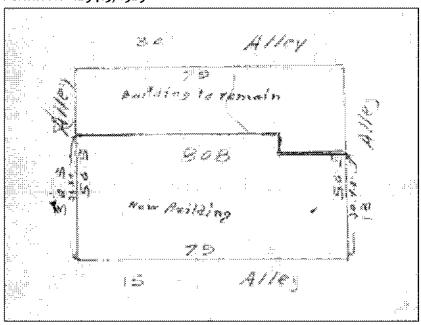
Detail, plat of proposed building addition in Lot 808. Permit to Build No. 129415, November 21, 1929. National Archives and Records Administration.
